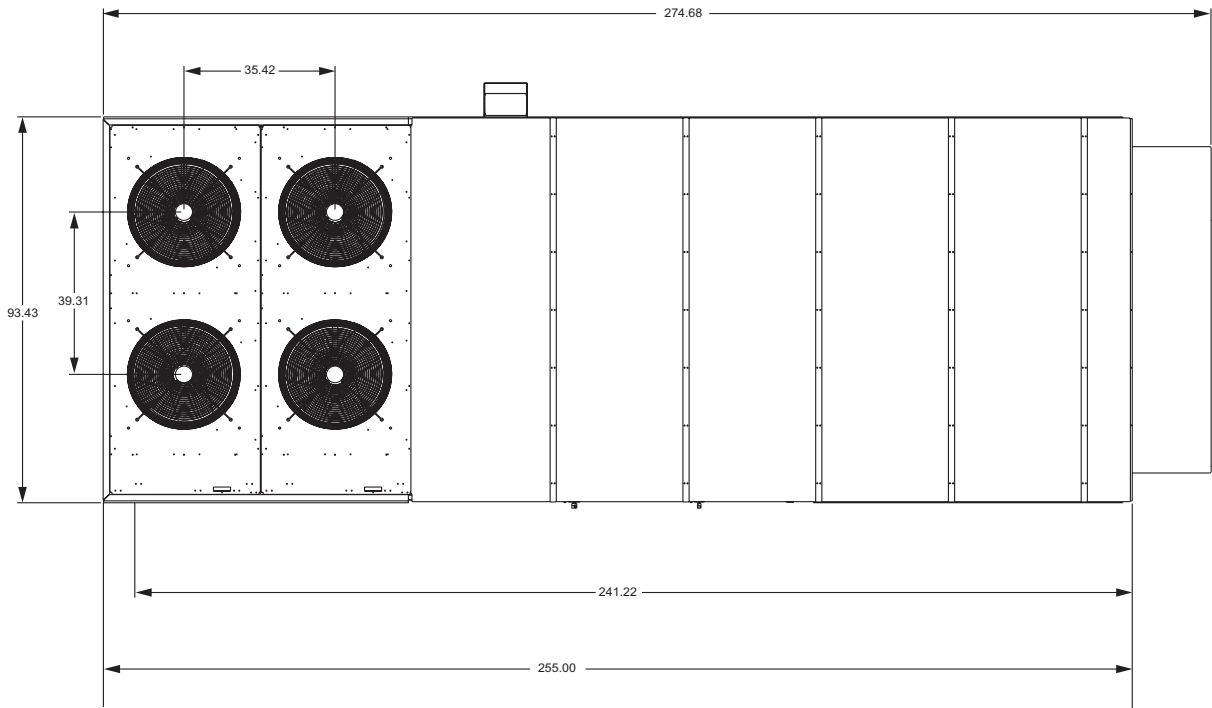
40 TON SERIES 40 OVERHEAD VIEW
